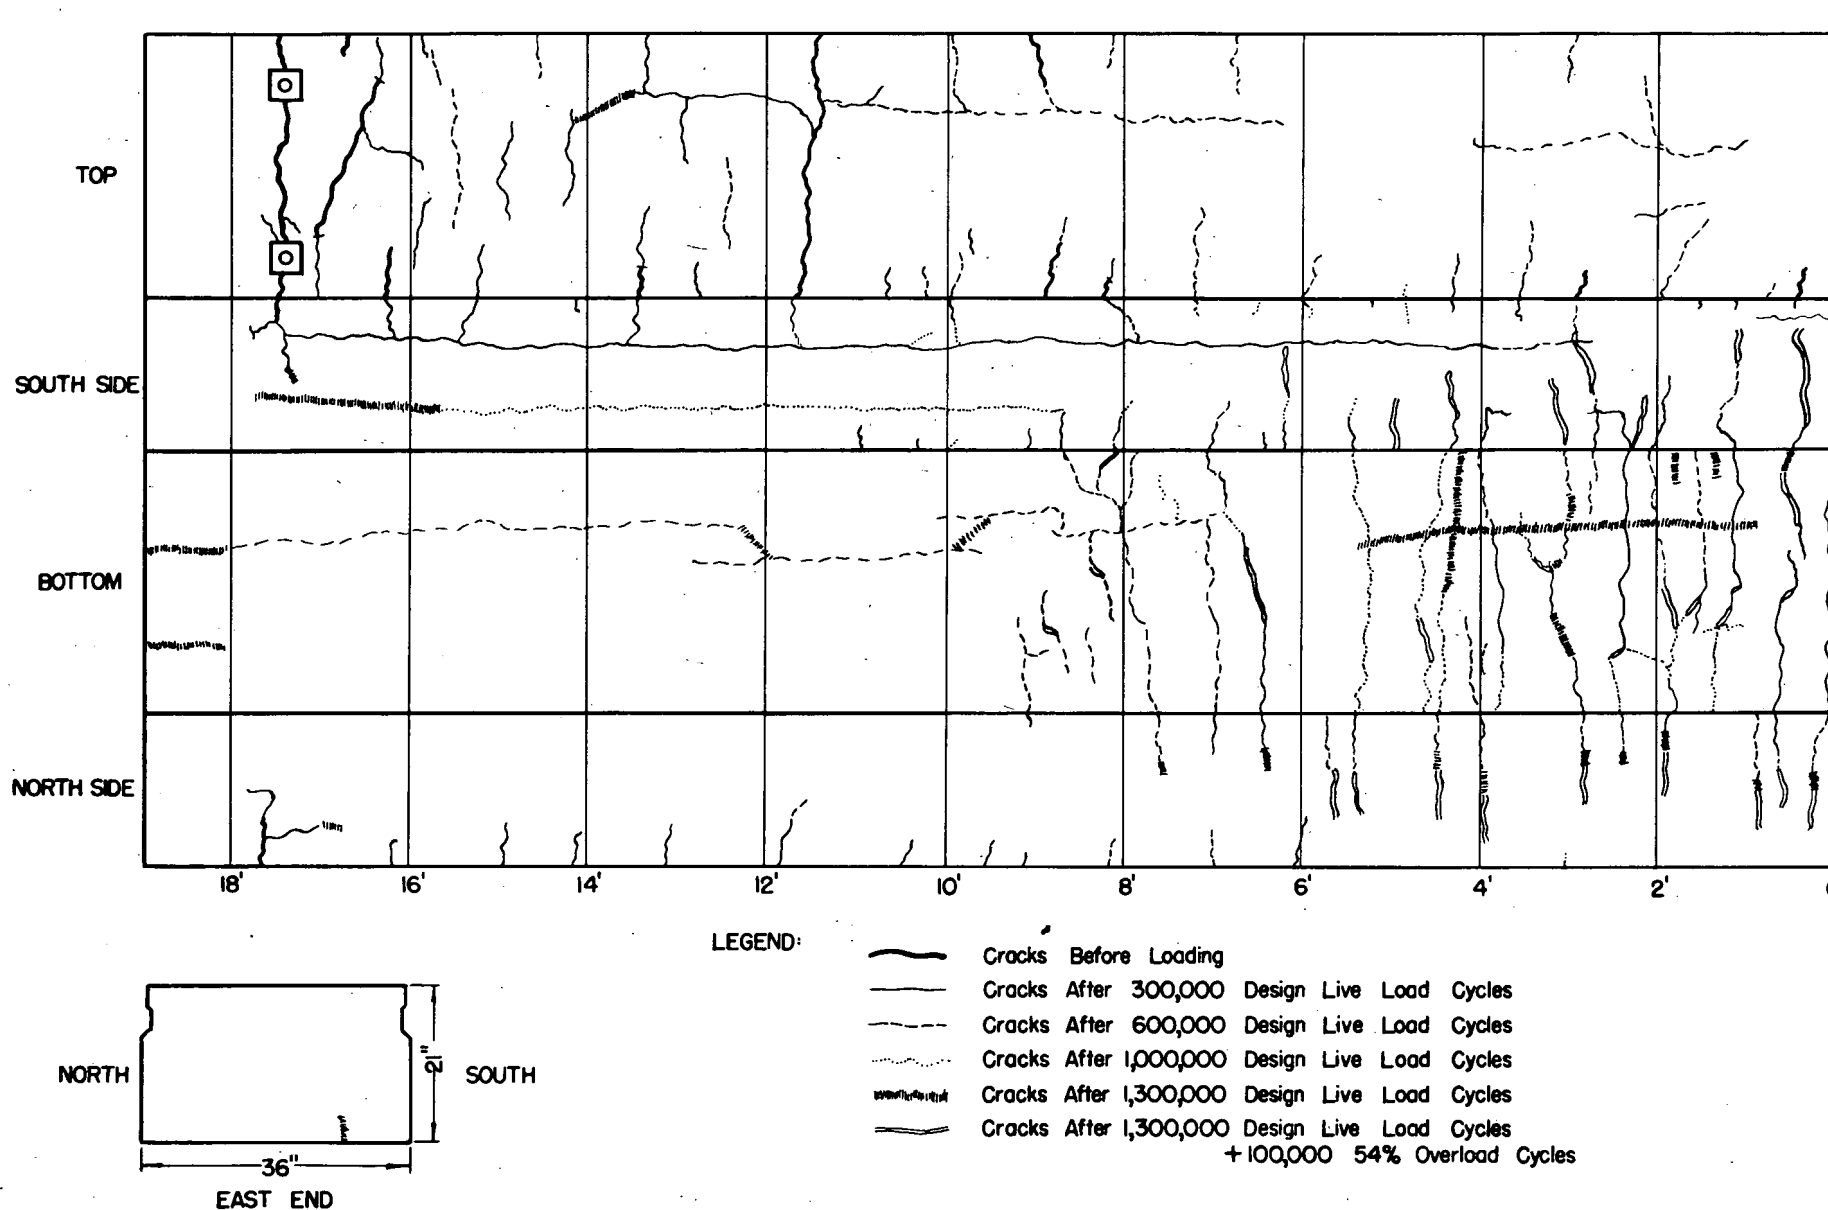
DEVELOPED VIEW OF TEST BEAM SHOWING CRACKS
